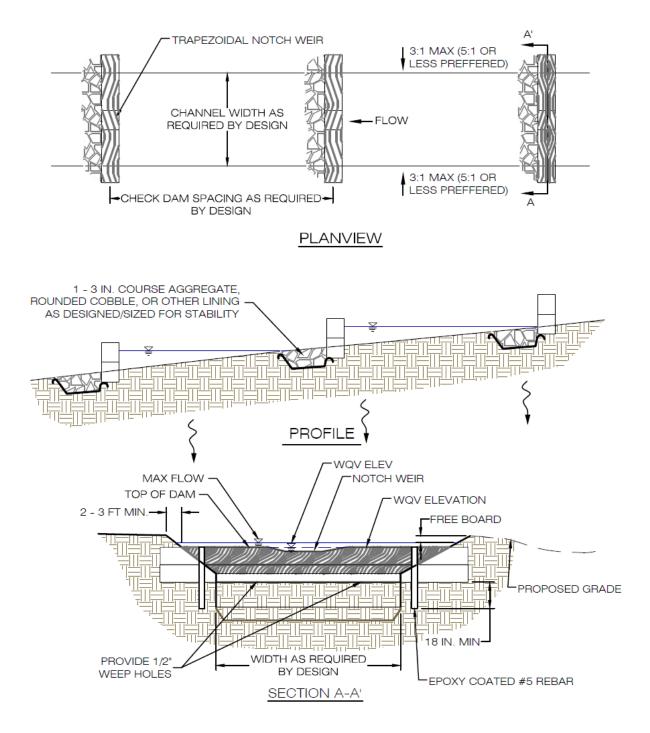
A.3 Grass Channel with Check Dams – Typical Plan, Profile, and Section
